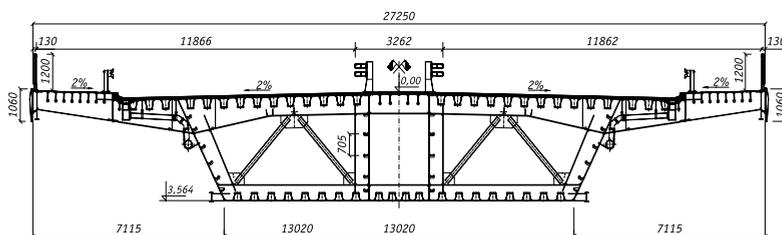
Roadway Bridge over the River Vistula in Plock (Poland) – cross section
